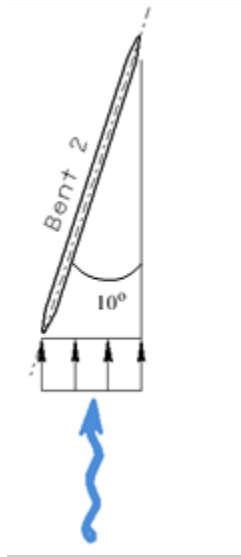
Longitudinal to Pier Forces due to Stream Flow
